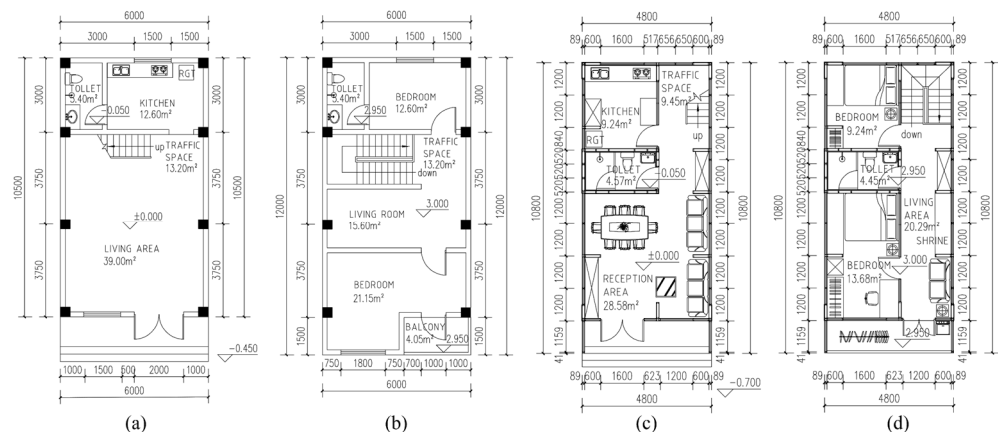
Comparison between typical residential floor plans in Mandalay and the prototype floor plan of the proposed post-disaster housing design in Mandalay. (a) Typical first-floor plan of houses in Mandalay, (b) typical second-floor plan of houses in Mandalay, (c) first-floor plan of the post-disaster reconstruction housing prototype in Mandalay, (d) second-floor plan of the post-disaster reconstruction housing prototype in Mandalay.
